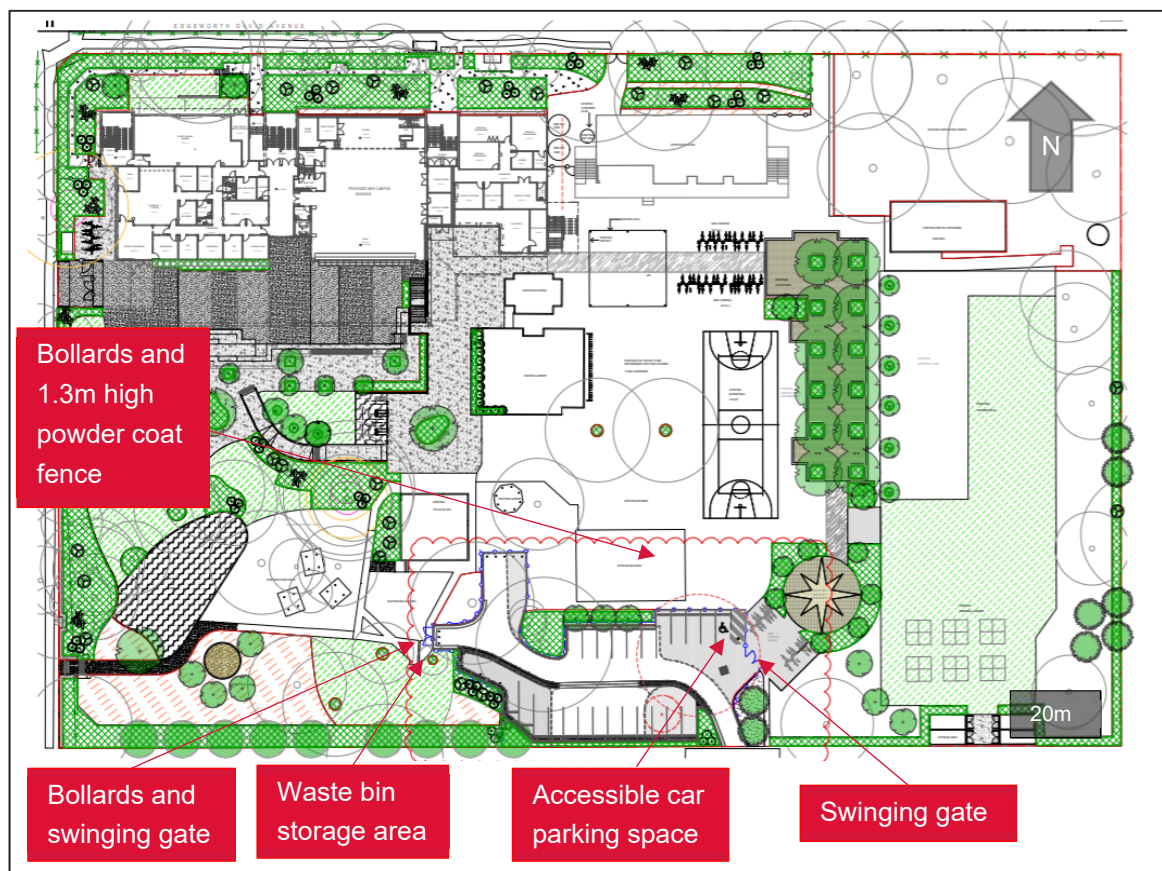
| Proposed landscape plan (Source: Applicant's modification application 2020)
